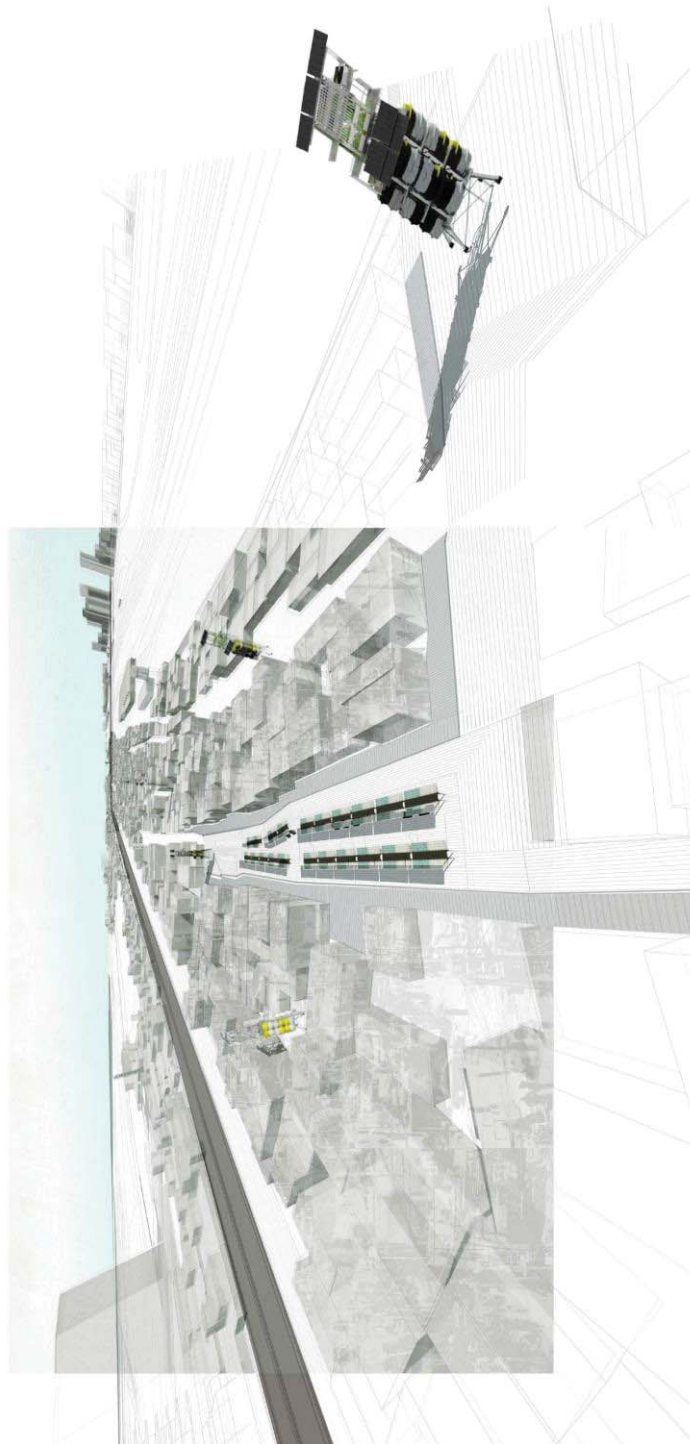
Aerial view of plaza and towers (Source: Author)
